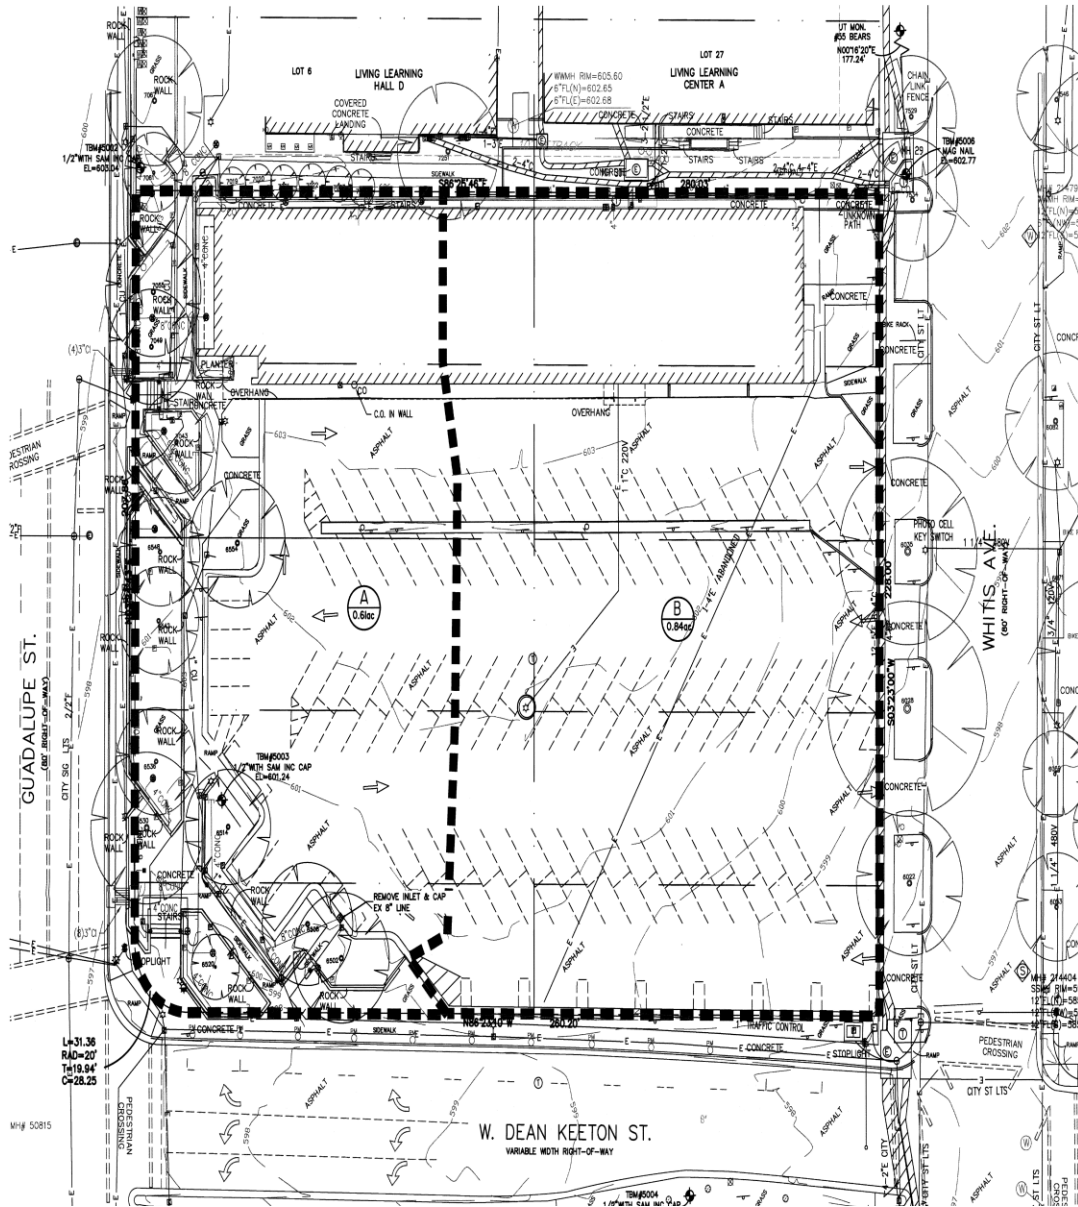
Pre-Construction Conditions provided by Ten Eyck Drainage Area Plan from Construction Documents
